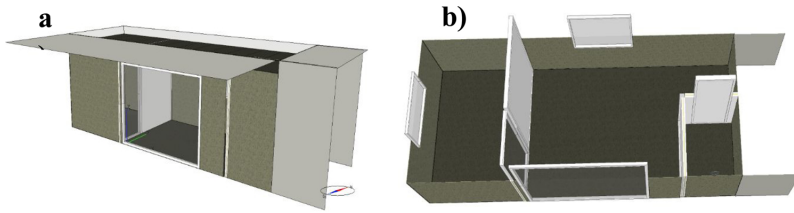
Building model from IDA ICE. a) envelope with shading surfaces b) interior walls and openings.
